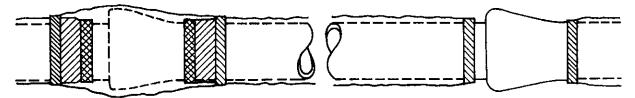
Method B: Separate pieces of polyethylene tube for barrel of pipe and for joints. Tube over joints overlaps tube encasing barrel.
